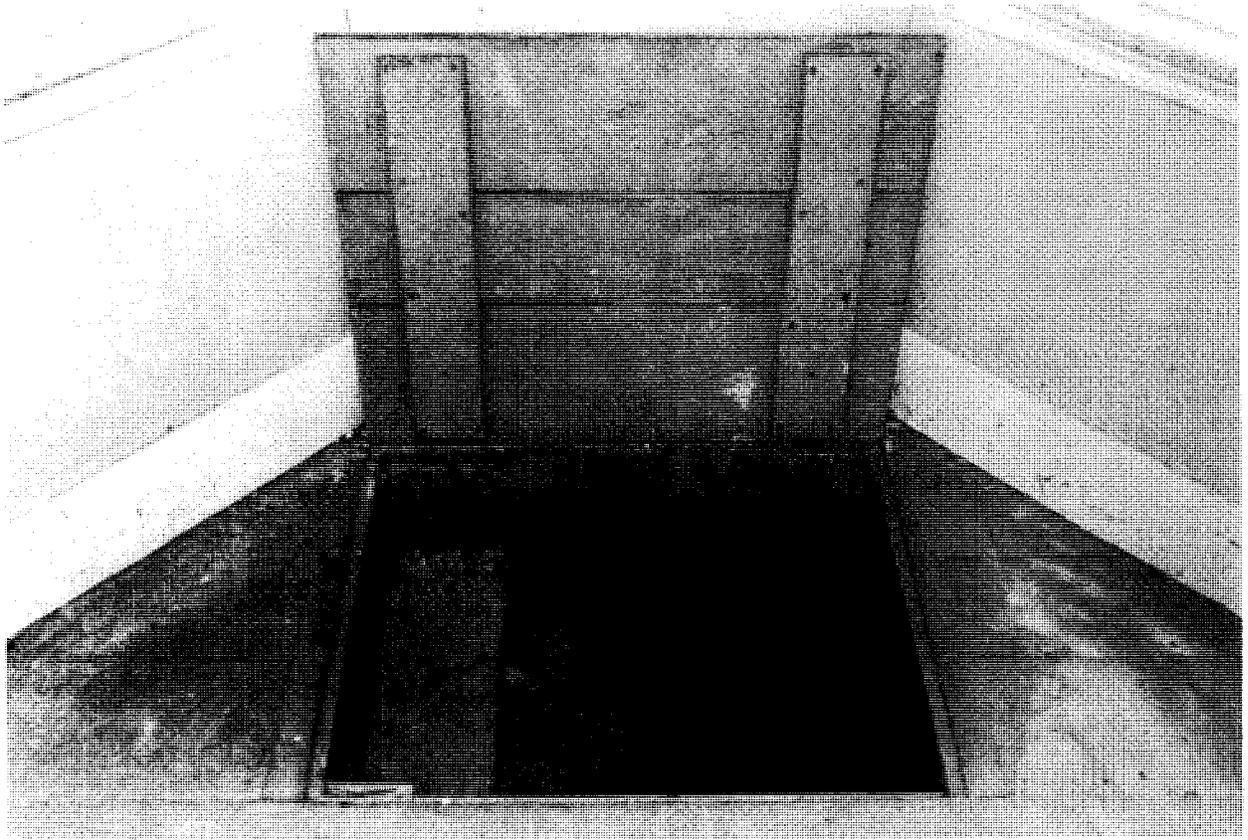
Penniman House: Cupola, Trap Door in Floor (1984).
